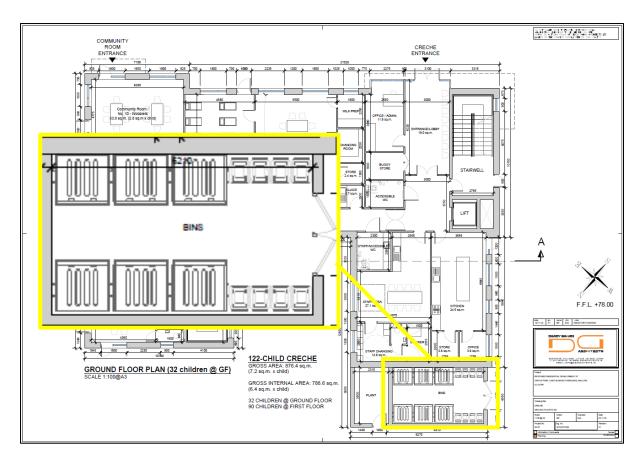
Location and Internal Layout of Waste Storage Area for Crèche (Yellow)
